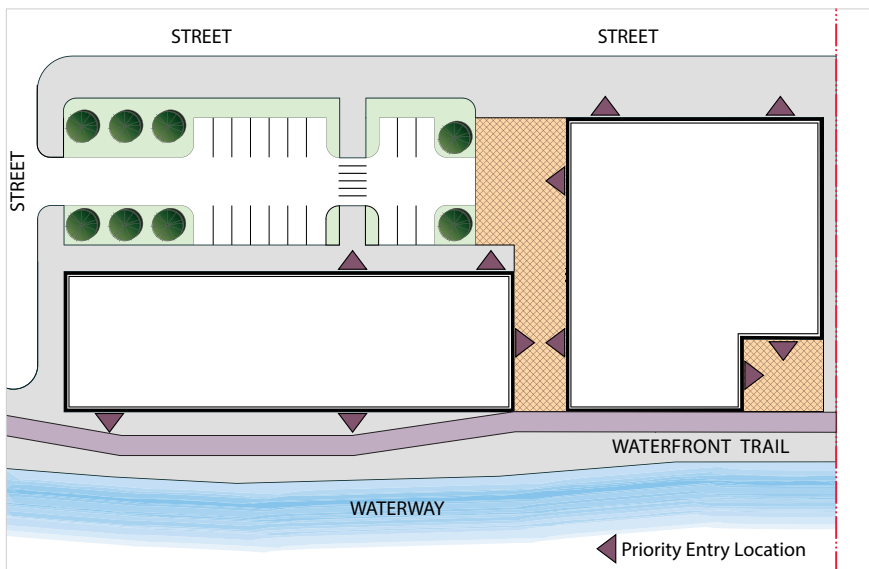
If adjacent to a waterway, orient a building's primary entry to face the waterway.
